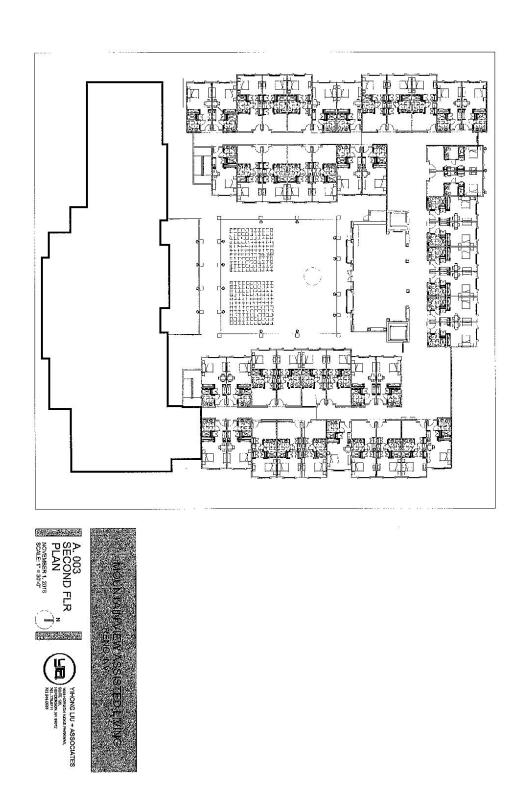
32 BED MEMORY CARE/82 BED ASSISTED LIVING GROUND 2ND FLOOR PLAN
